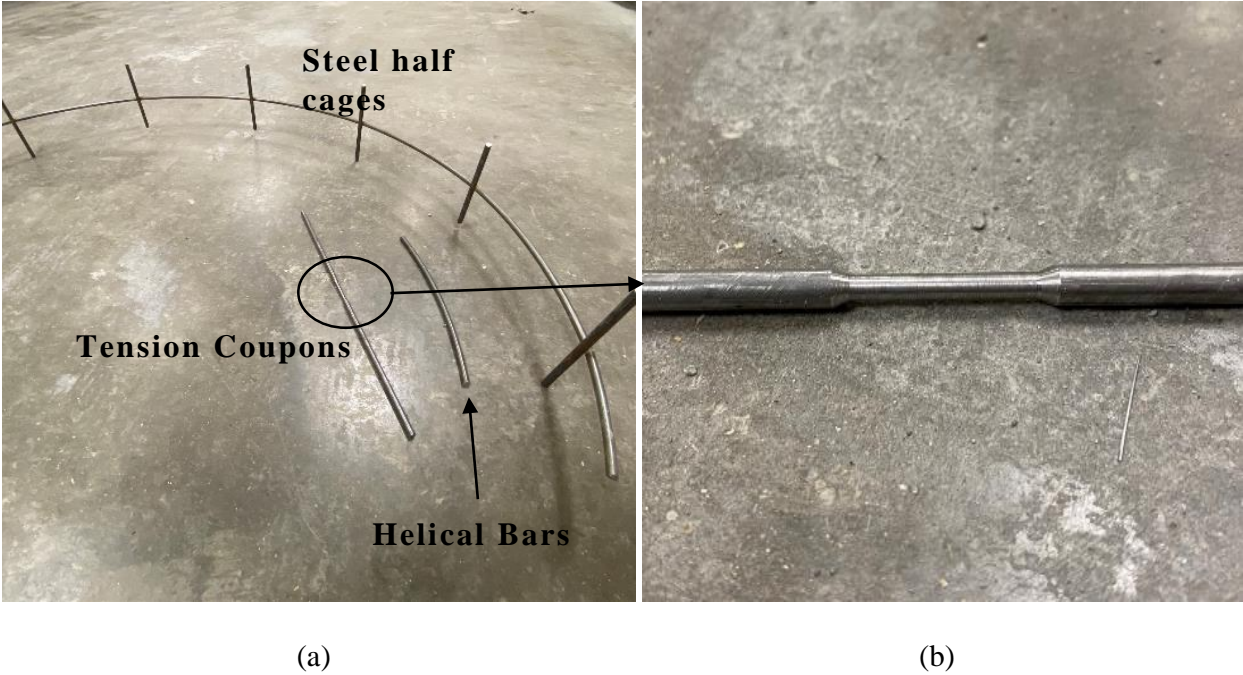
Steel specimens, (a) steel half cage, helical bar and tension coupon and (b) reduced section in the tension coupon specimen.
